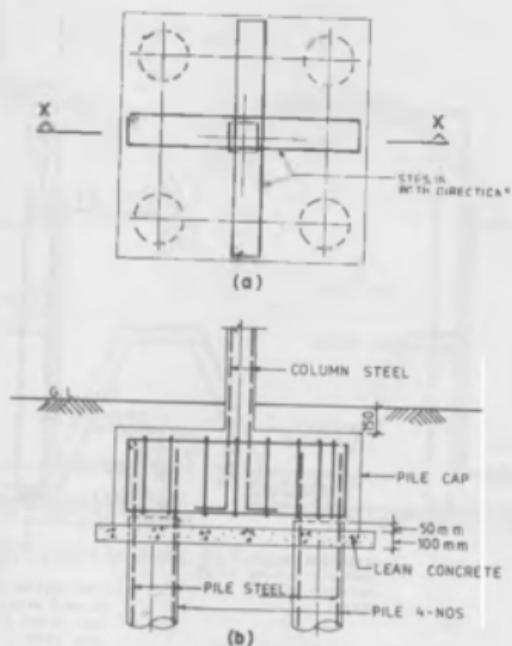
Pile cap detailing. (a) Plan of pile cap and pile group; (b) Section X-X.
